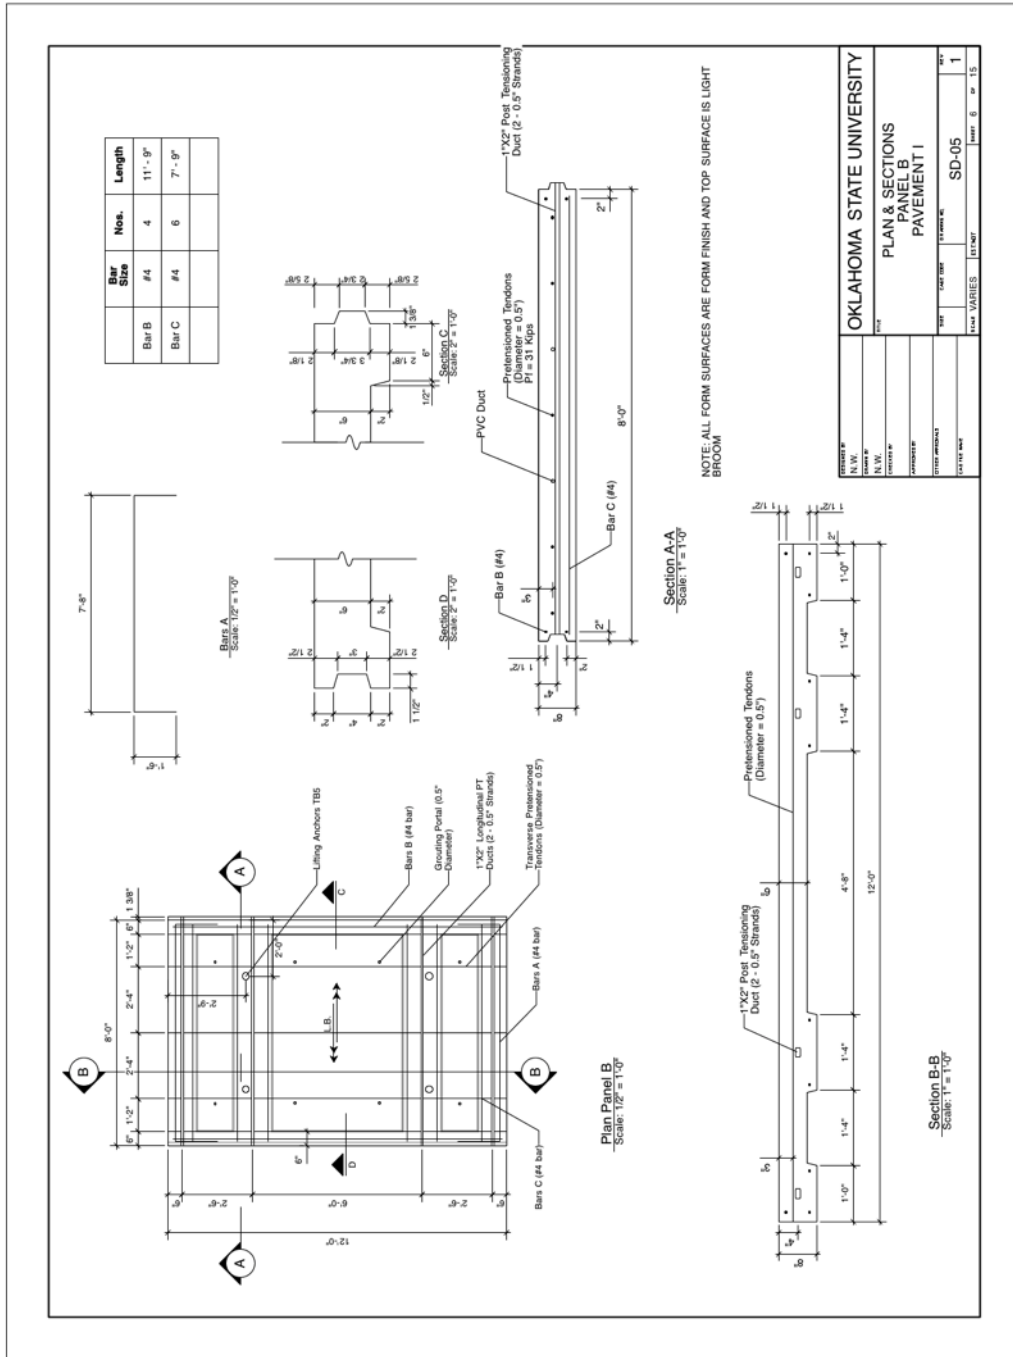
Pavement construction drawings “Plans and Sections Panel B Pavement I”
